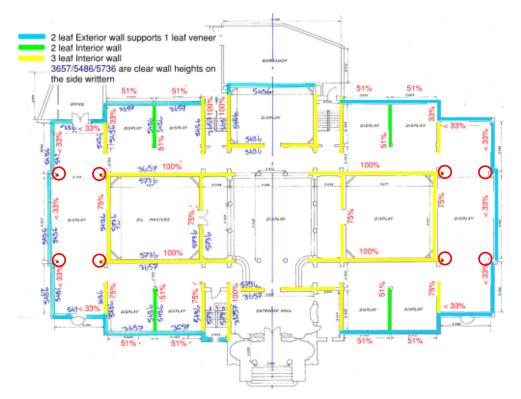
Plan indicating the % current code for out-of-plane wall capacity. The red circles indicate the locations where roof beams are supported on pilaster columns with very limited seismic capacity.
